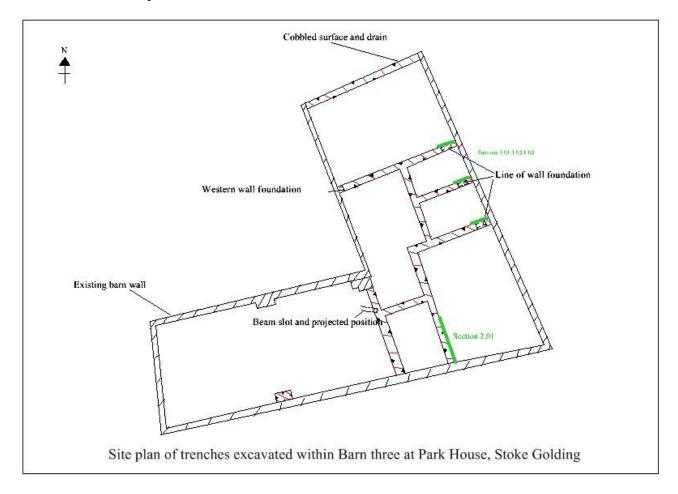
Trenches excavated within the eastern barn, illustrated using the 1:100 plans supplied.
